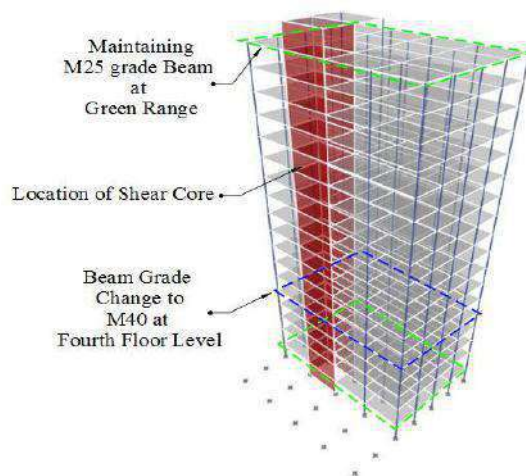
Beam Stability Case - Beams of different sizes (All M40 grade beams at fourth floor level): Case BS3
